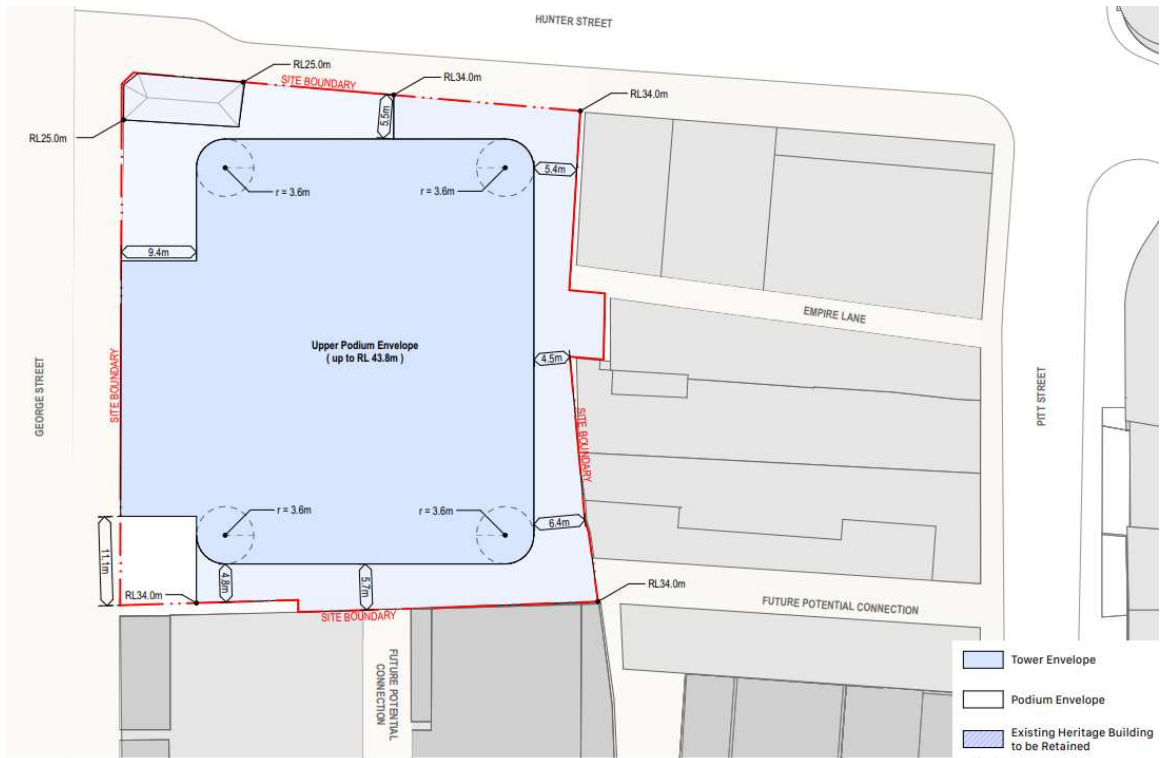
Plan of Hunter Street West planning envelope. Source FJMT Studio, December 2021
